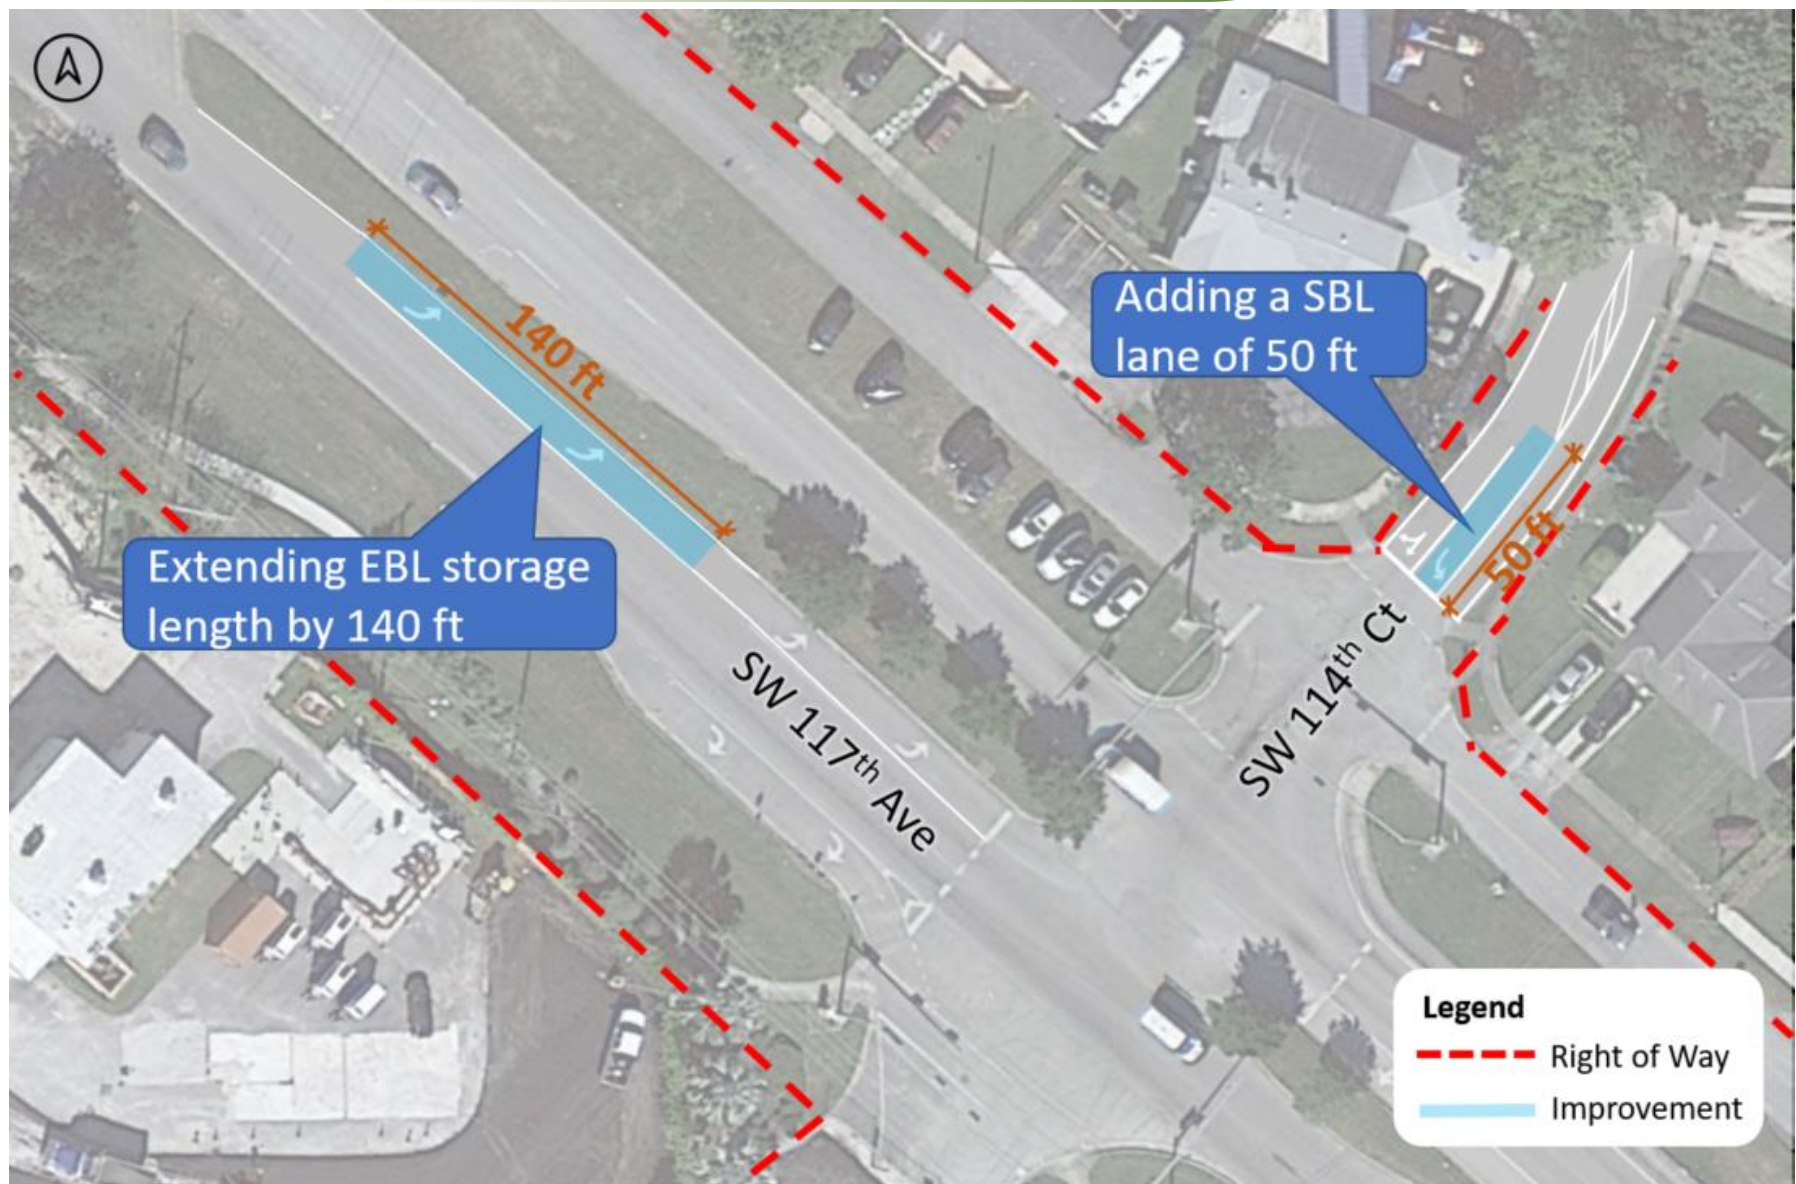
Conceptual Design Plan – SW 117th Avenue and SW 114th Court
